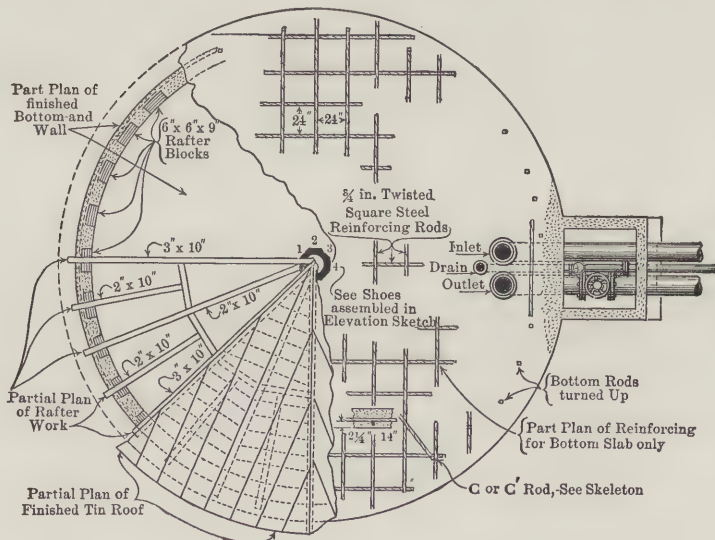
60000 GALLON CONCRETE RESERVOIR—PLAN VIEW
